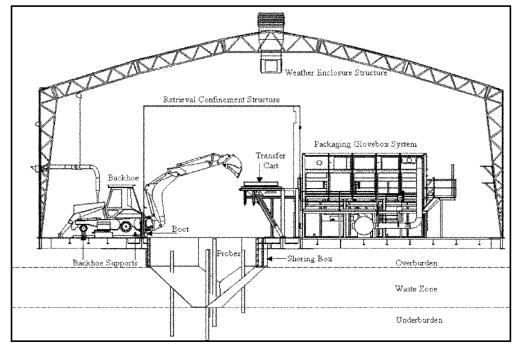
Cross section of the Glovebox Excavator Method Project facility.
